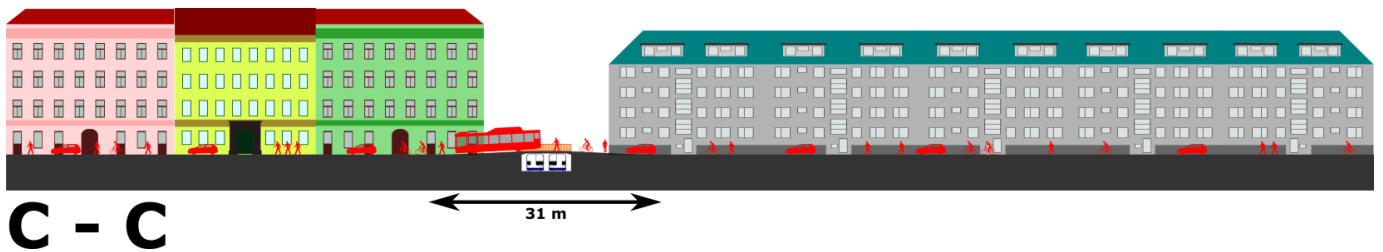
Longitudinal section of a road, crossing the LCRT line with a deep underpass
